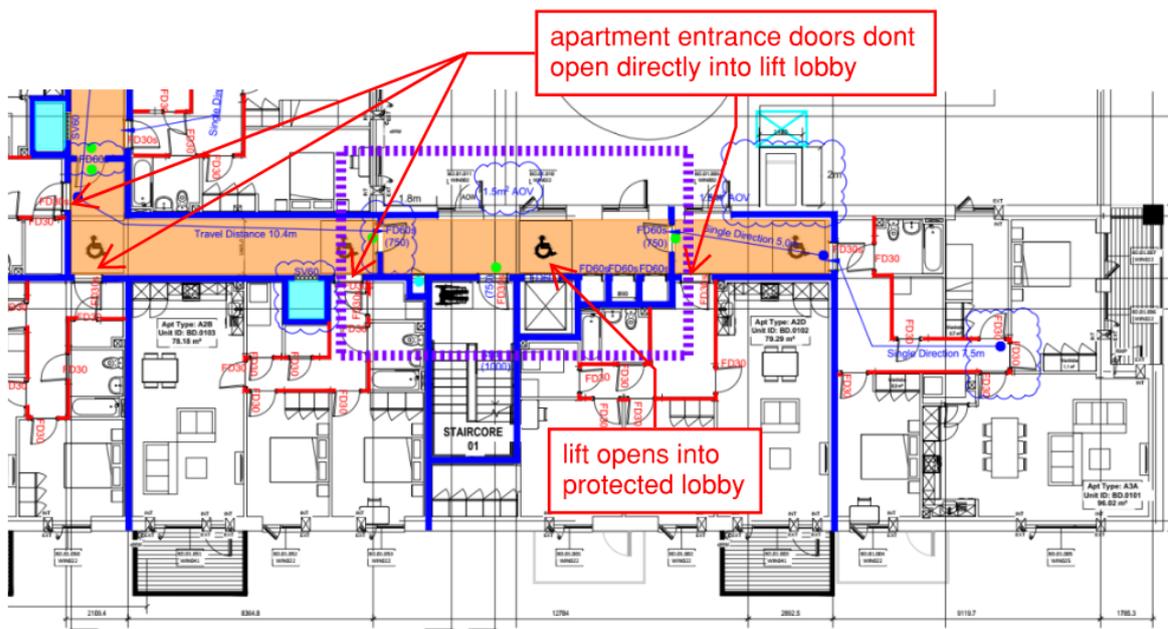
Block D, typical upper floor plan – lift accessed via lift lobby with no apartments opening into same
